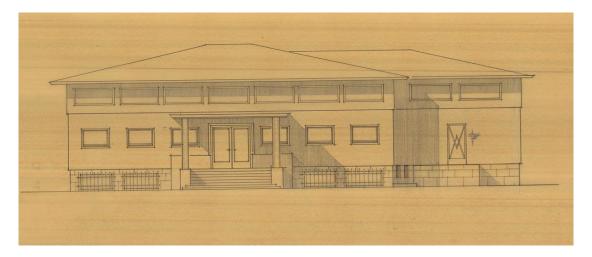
Proposal of an additional building on the north of the workers club, the east façade, Construction Section in General Directorate of TEKEL, 24.06.1947 (Source: TTA Archive)
